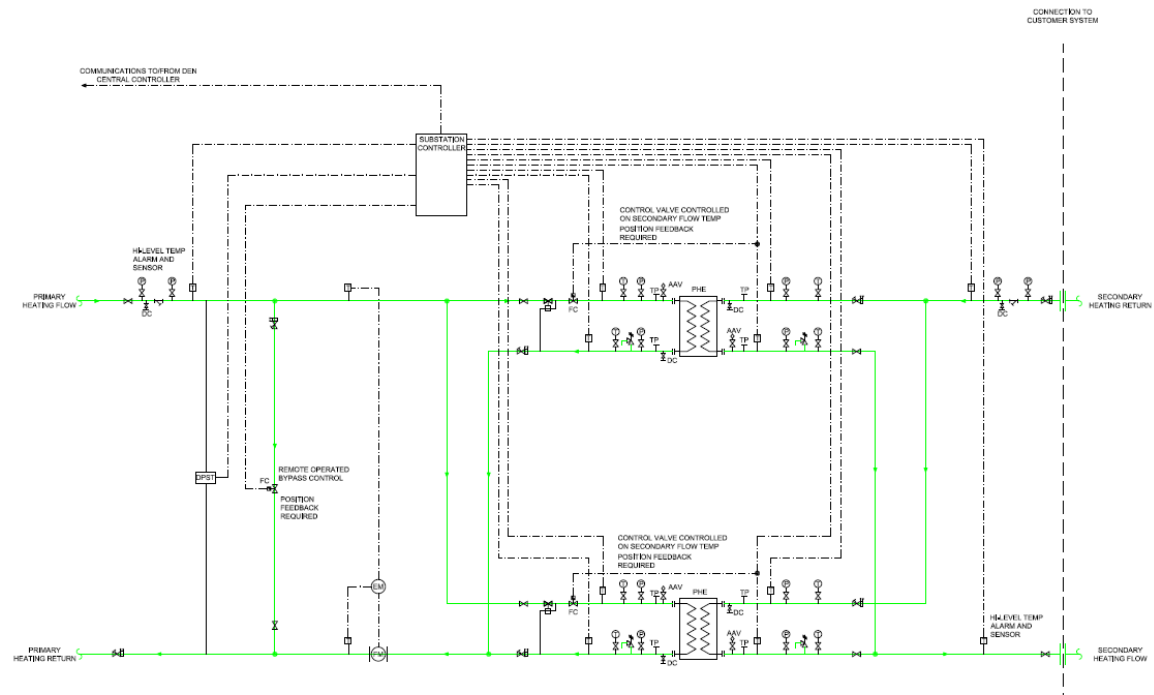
Typical Twin Plate Thermal Sub-station equipment schematic
